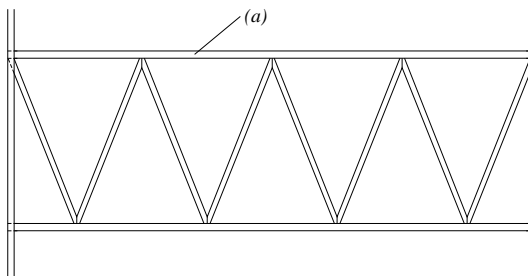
W-truss. (a) Braced beam. (STEP 1995 Article D9)
